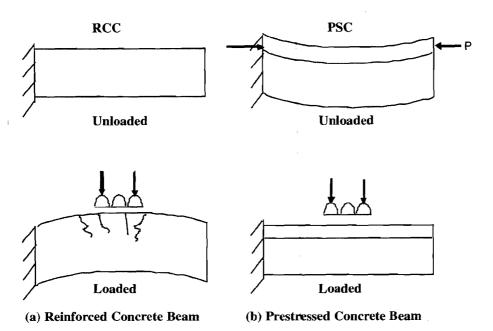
Behaviour of Reinforced Concrete Beam and Prestressed Beam
